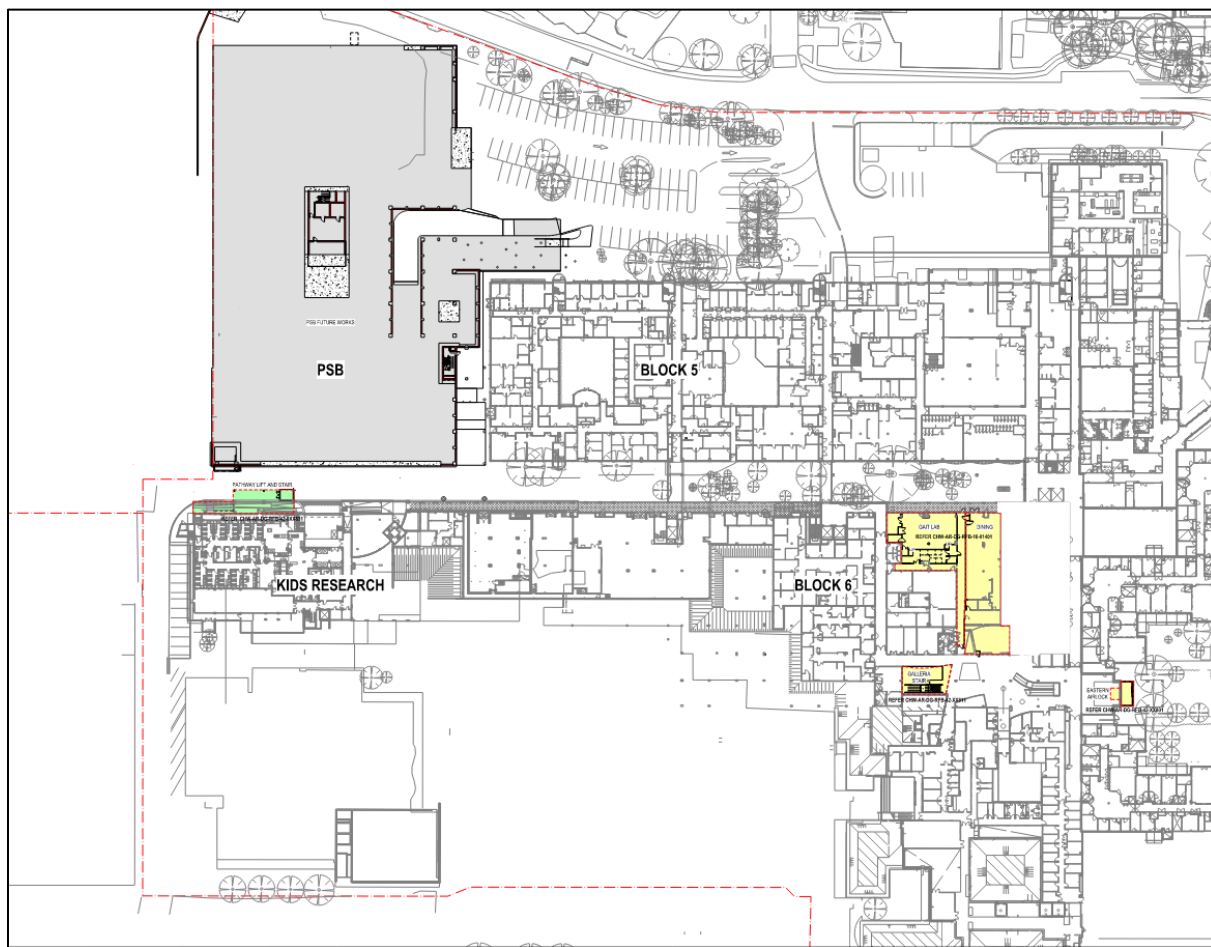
General Arrangement Level 1 including Gait Lab, Dining and Galleria stair. (Source: BLP)
